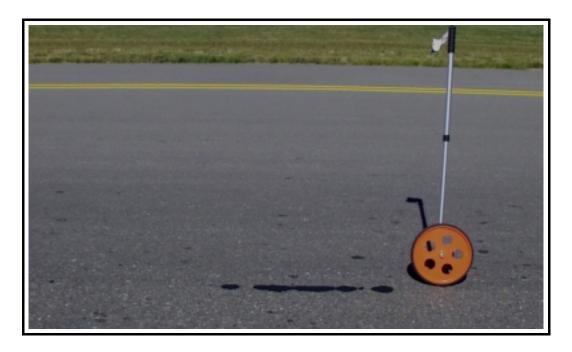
Minor bleeding along longitudinal joint in PG Test Section September 2000
